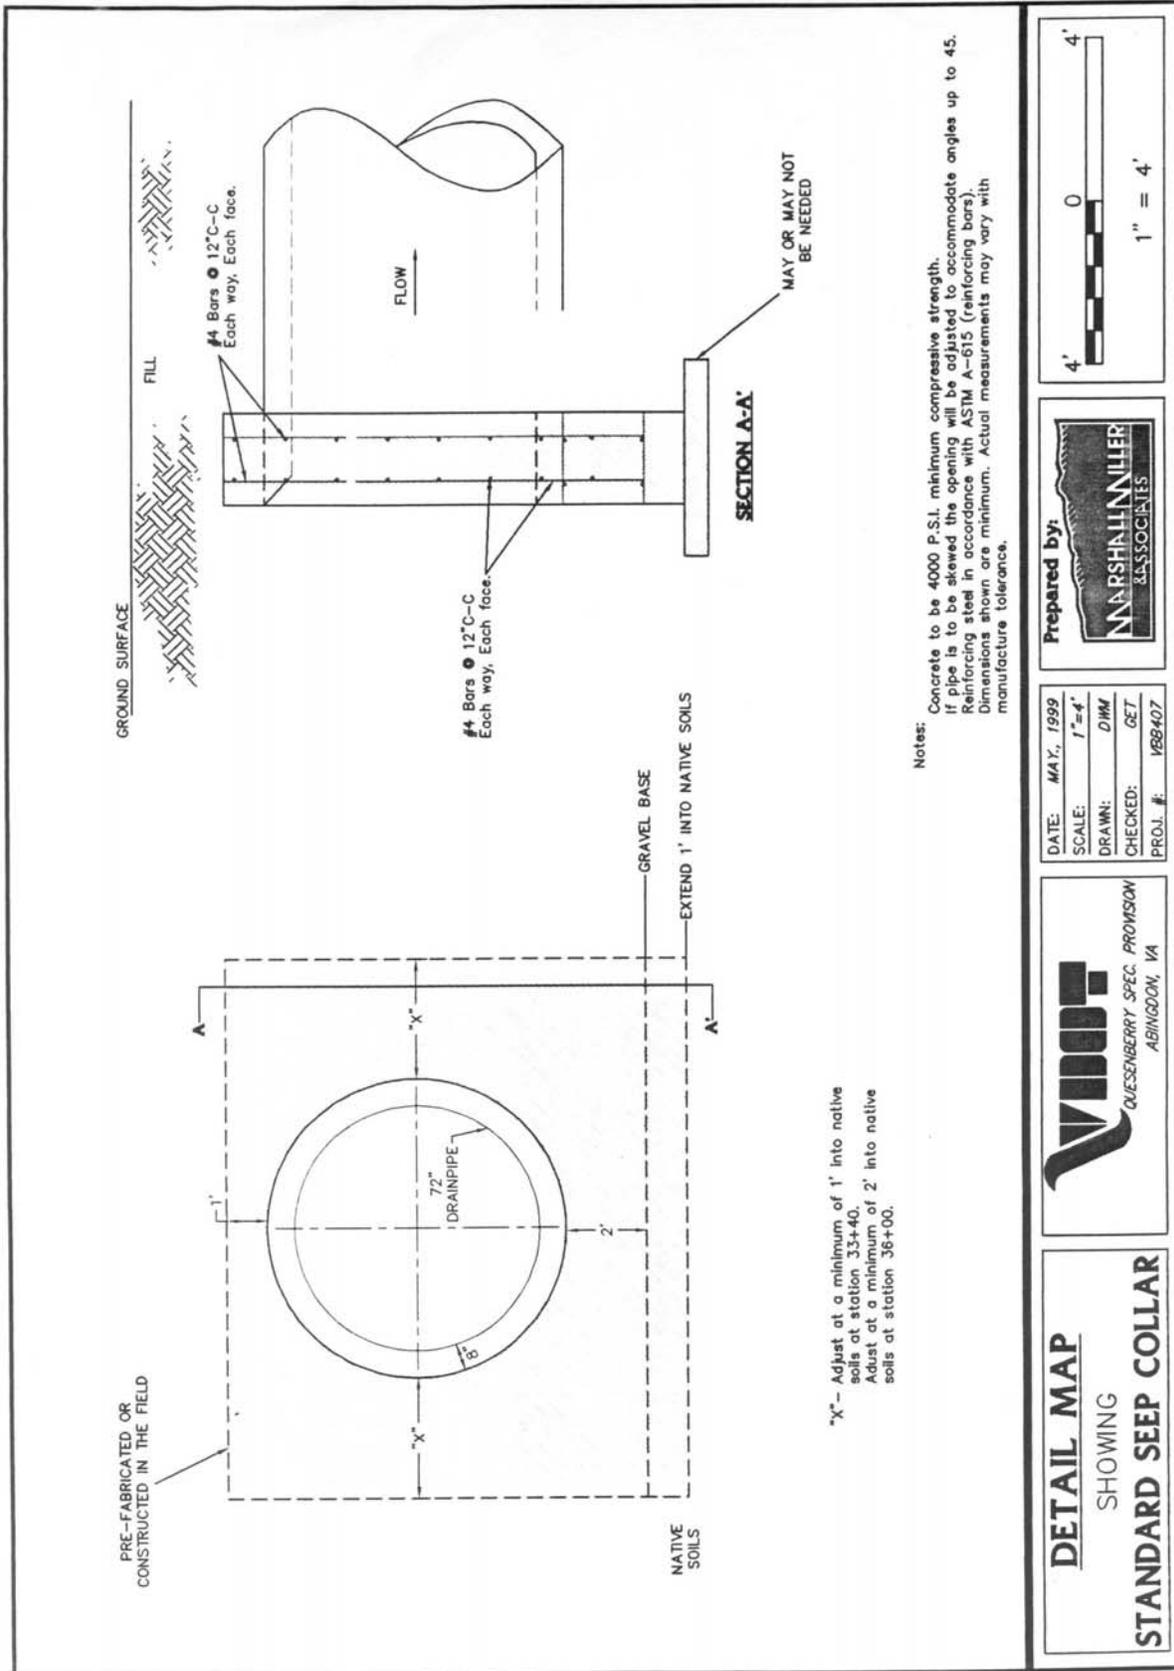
Anti-seep Collar Detail (MM&A 1999A)
